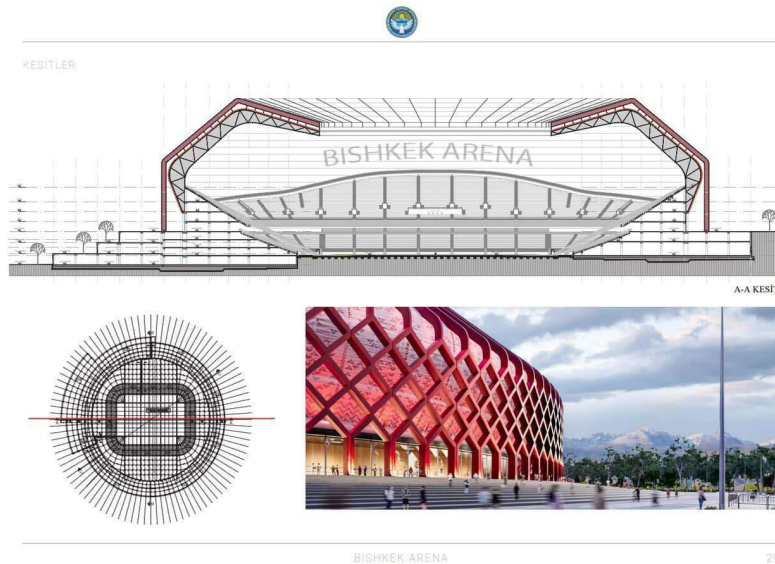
DETAILED ARCHITECTURAL FLOOR PLAN AND EXTERIOR FAÇADE RENDERING OF THE BISHKEK ARENA.¹
